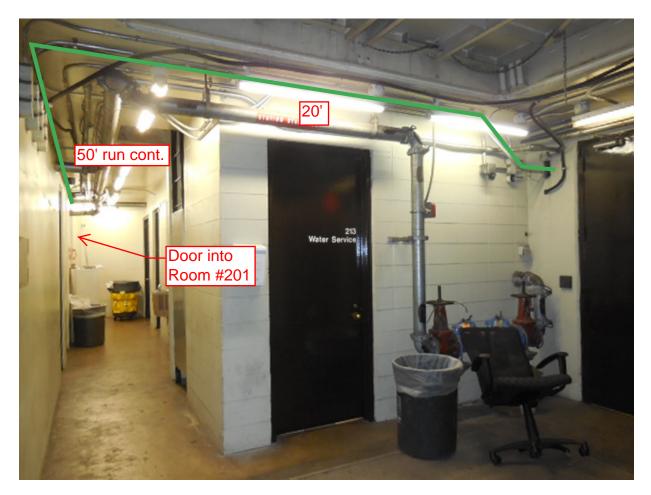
A03 Dupont Circle South: Proposed conduit run continuing down hallway of room #201 and towards room #215
